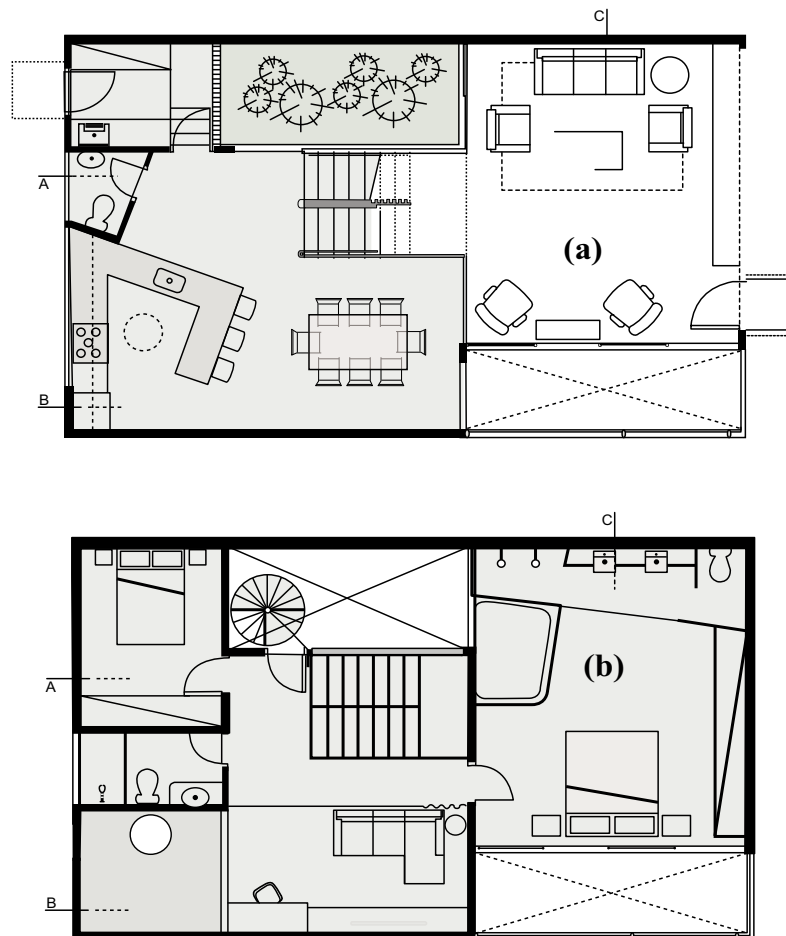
Floor plan: (a) ground floor plan; (b) top floor plan.
